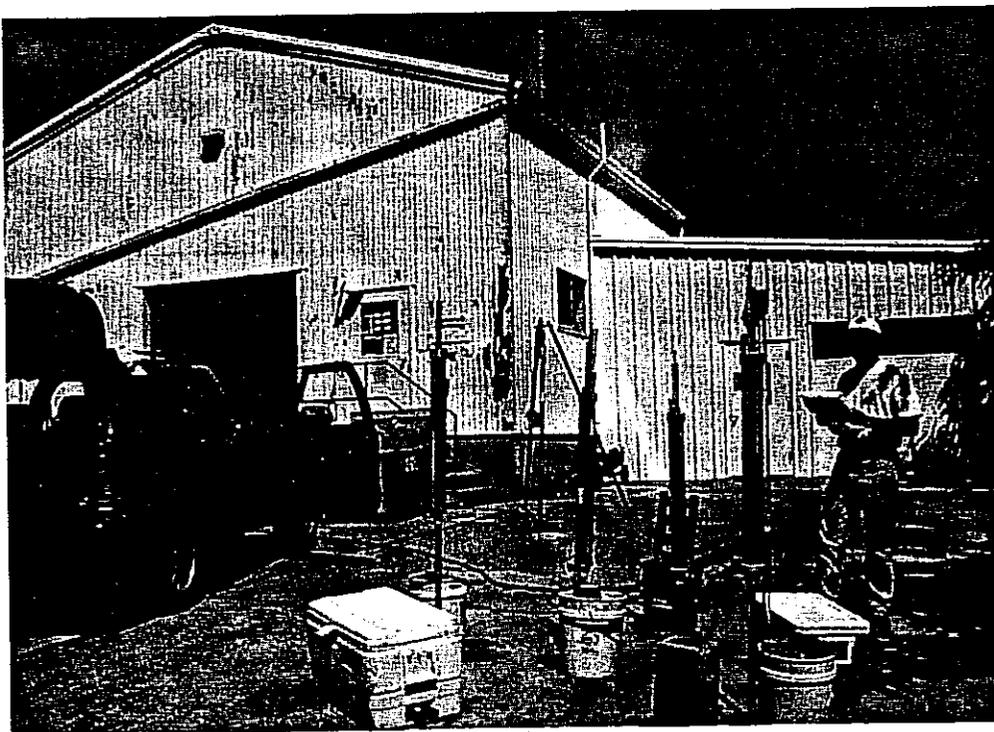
Guelph permeameter testing of BLIP test panel.
